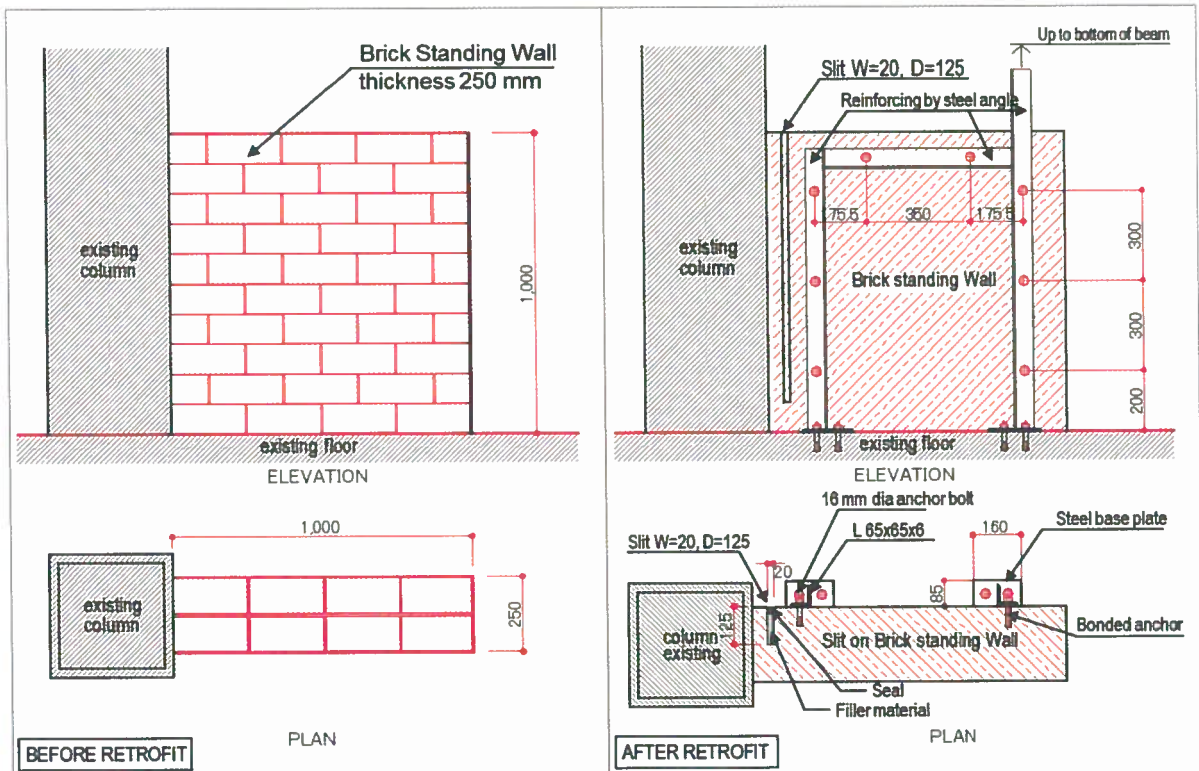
Details of a Structural Slit (Drawing for Test Work of CNCRP Project)
